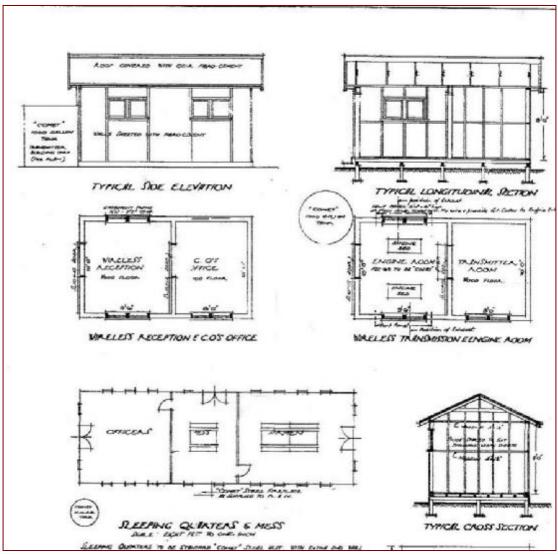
A WWII RAAF plan showing the standard design for hutments at aerodromes (NAA; SP155/1, DEF).
